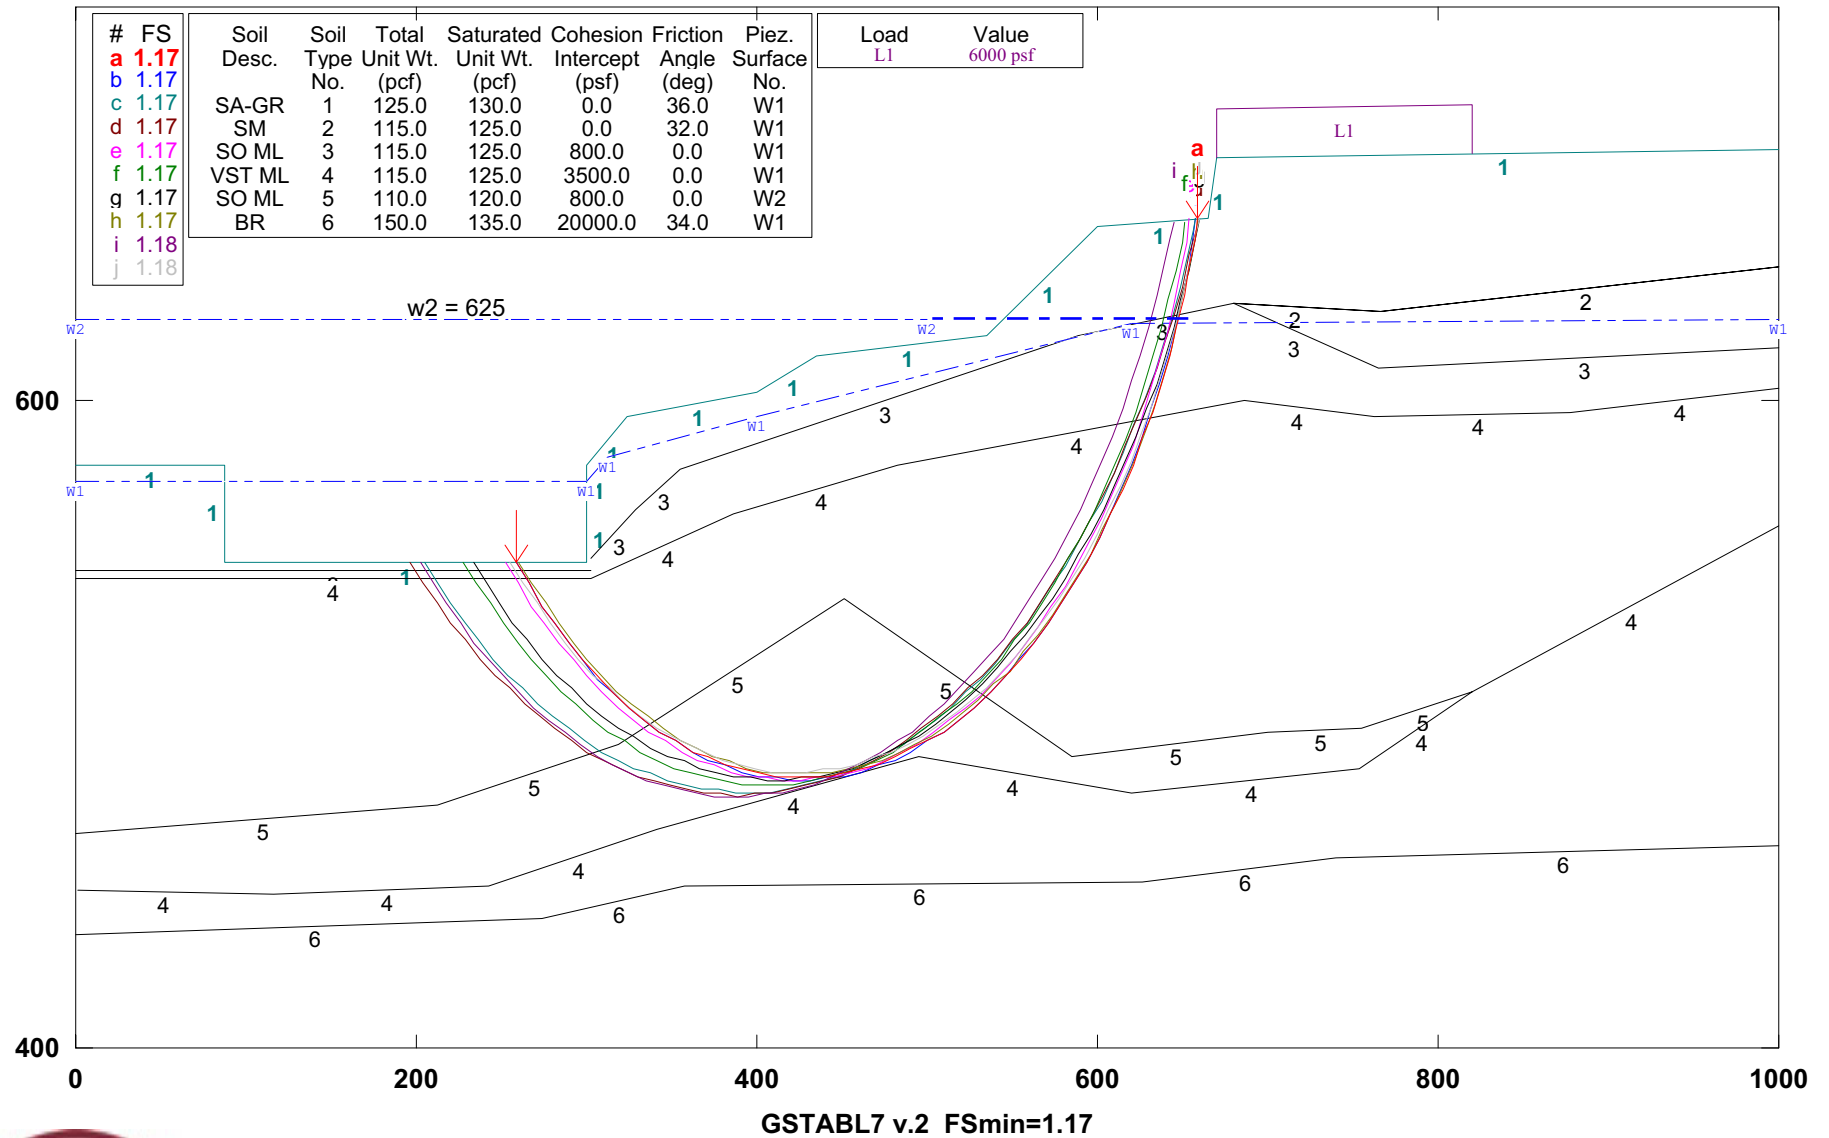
B.7: Stability of Existing Slope at Section A-A Using Undrained Analyses.
